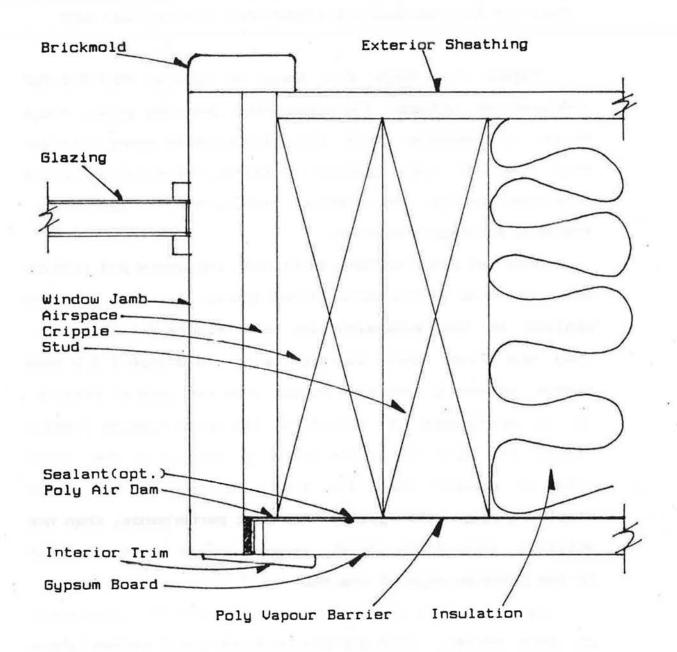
Top cross sectional view of POLY AIR DAM installation at studs (NOTE: staple PAD to framing or window jamb).
